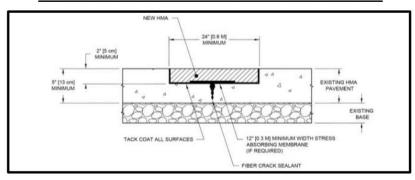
Partial depth crack repair in flexible pavement
